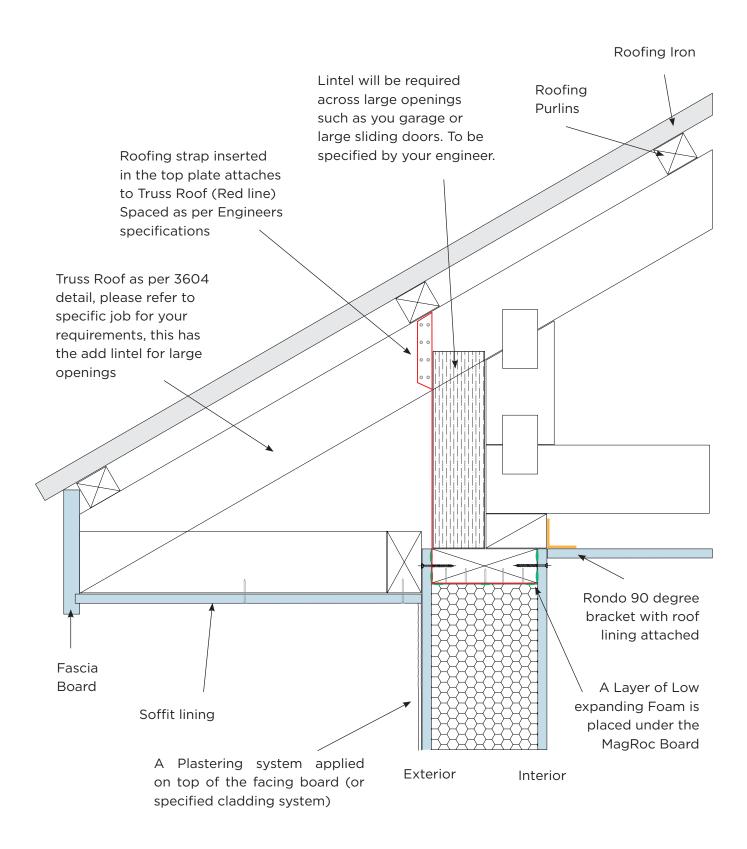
MagRoc 'Typical' Truss Roof with Lintel required & Square Soffit
